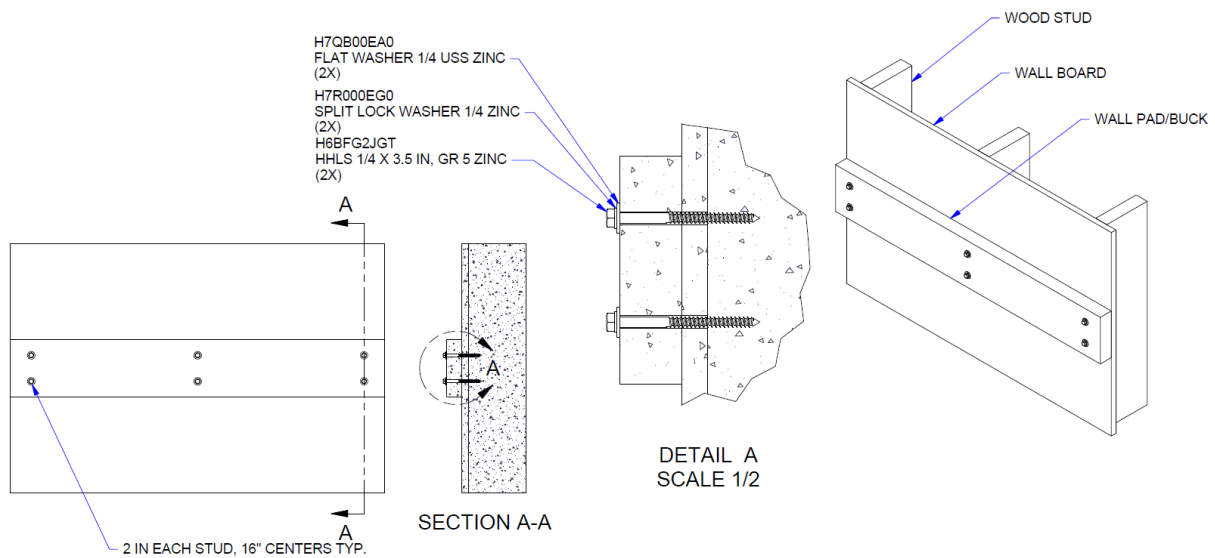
Wall Buck/Pad Steel Stud Wall Attachment (3' Wall Pad Shown)
